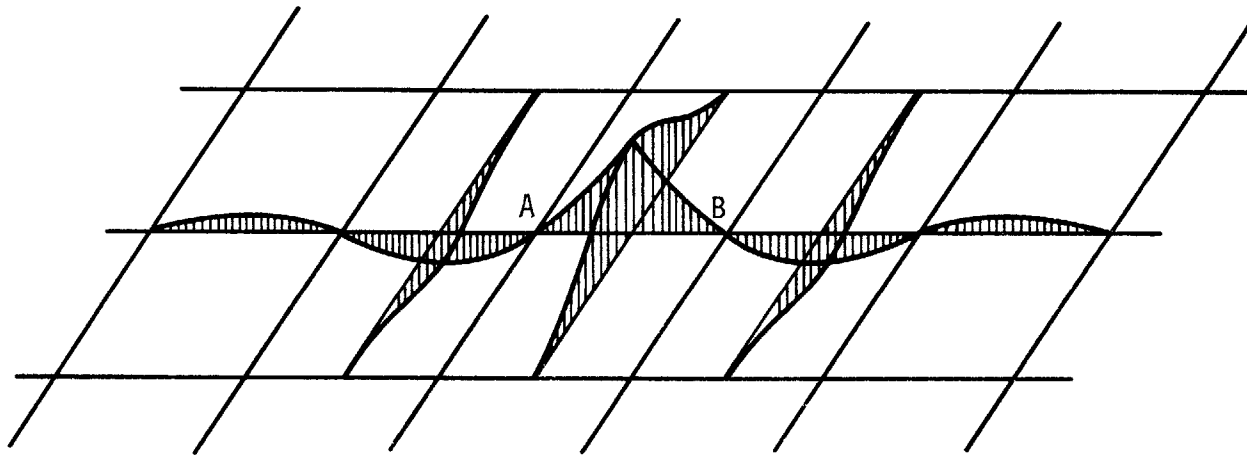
Plan View of a Floor Showing the Assumed Influence Surface
